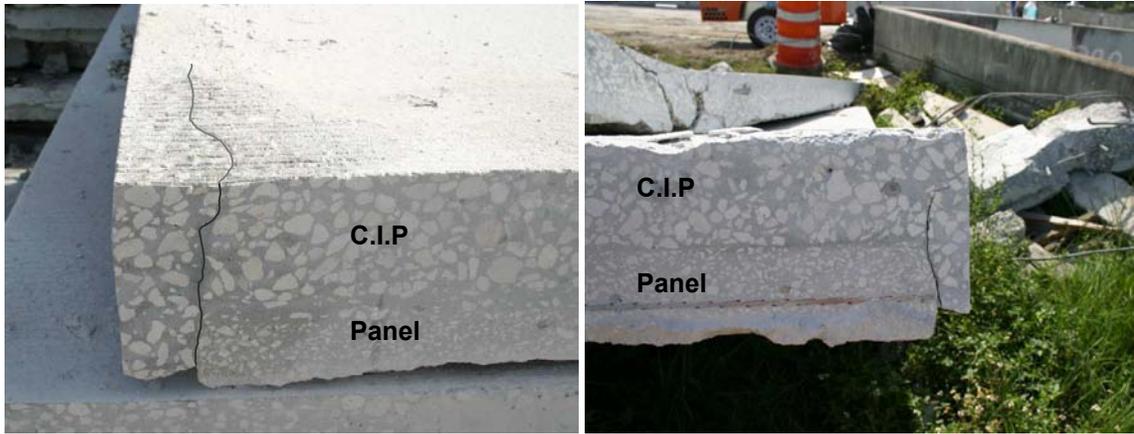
Vertical and Longitudinal Cracks Bridge #100398
